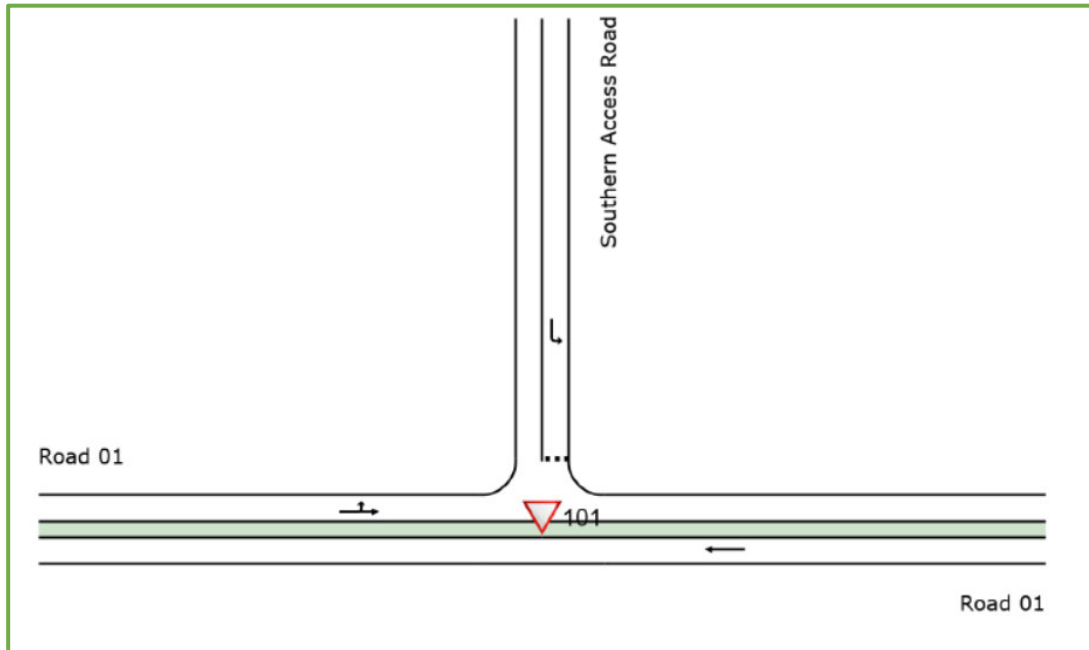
Amended Southern Access Road / Road 01 Intersection Layout
